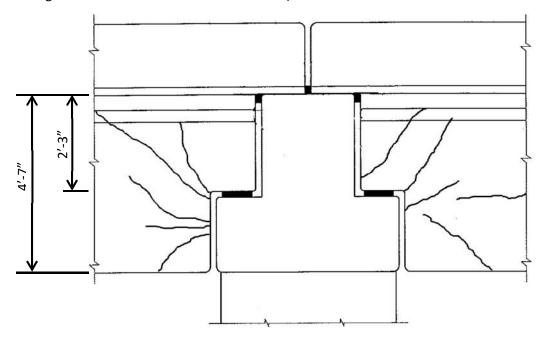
Typical Crack Location and Orientation at Tee Beam Ends
